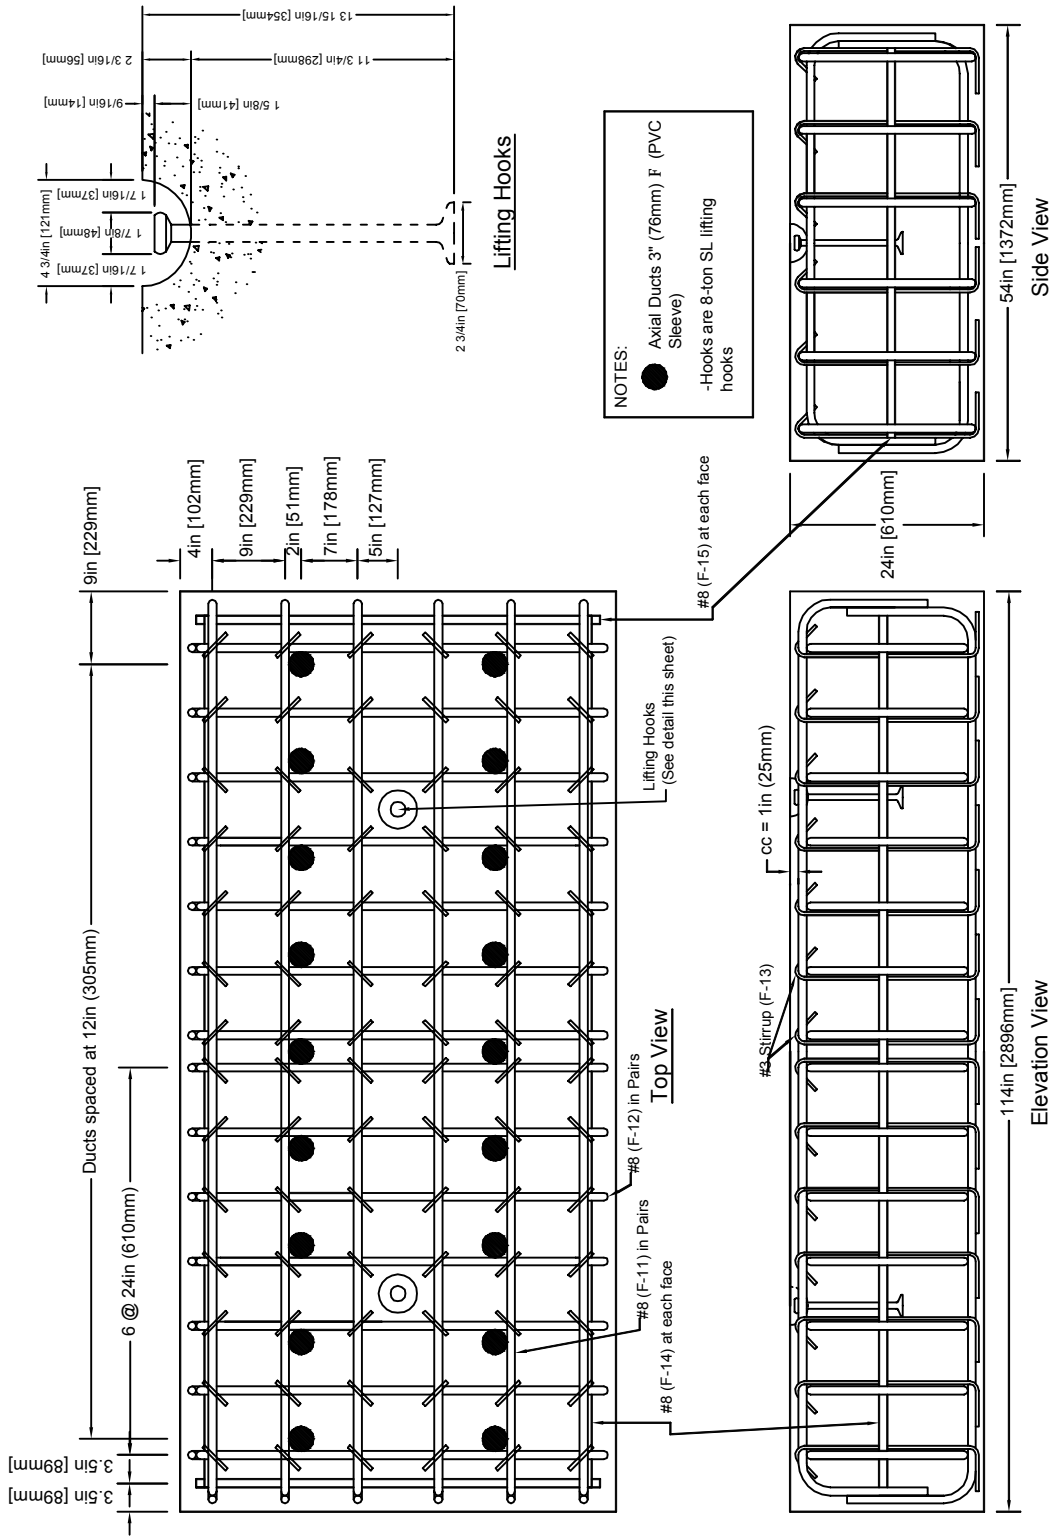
Bridge Plans Sheet 12; Footing Blocks.
